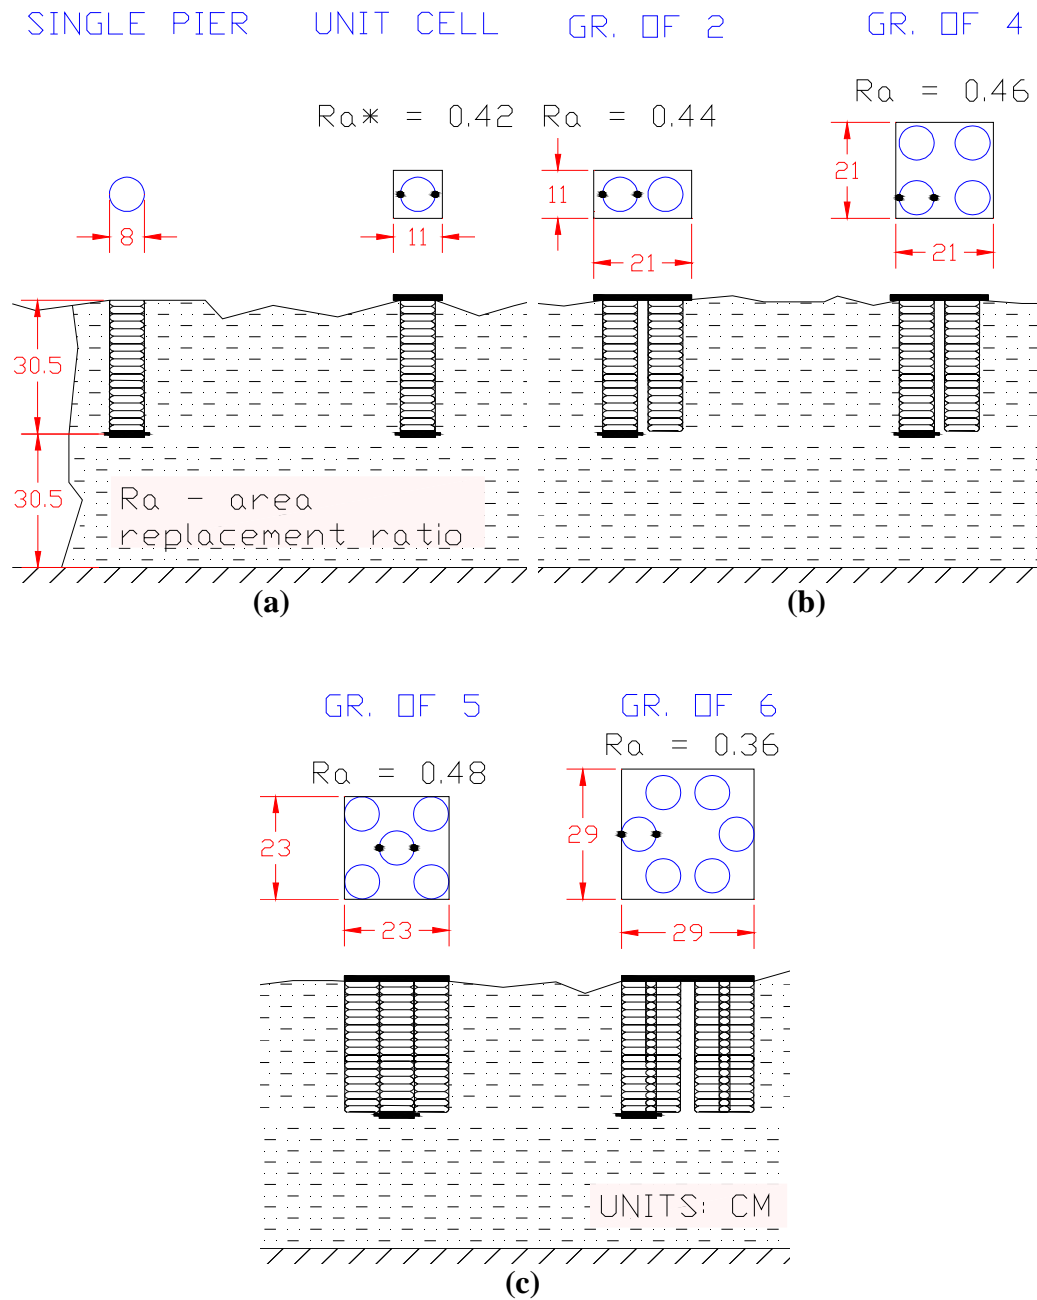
Test bed group pier layout for (a) single pier and unit cell, (b) group of two and four piers, and (c) group of five and six piers (profiles views)
